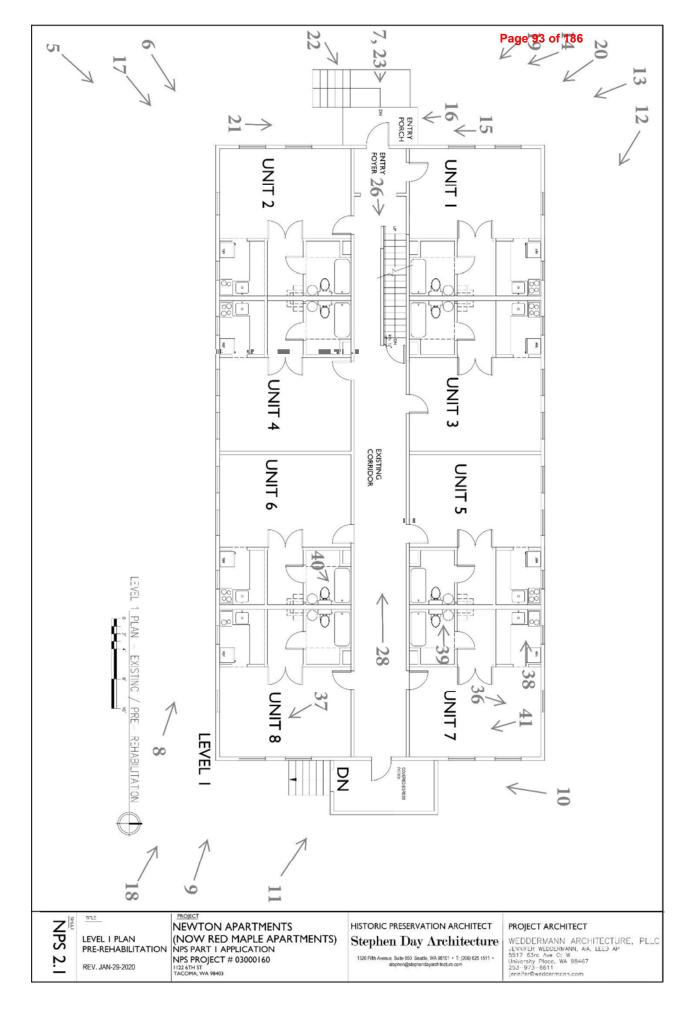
B. Newton Apartments, Level 1 Plan – Pre-Rehabilitation, Photograph Key Plan.
